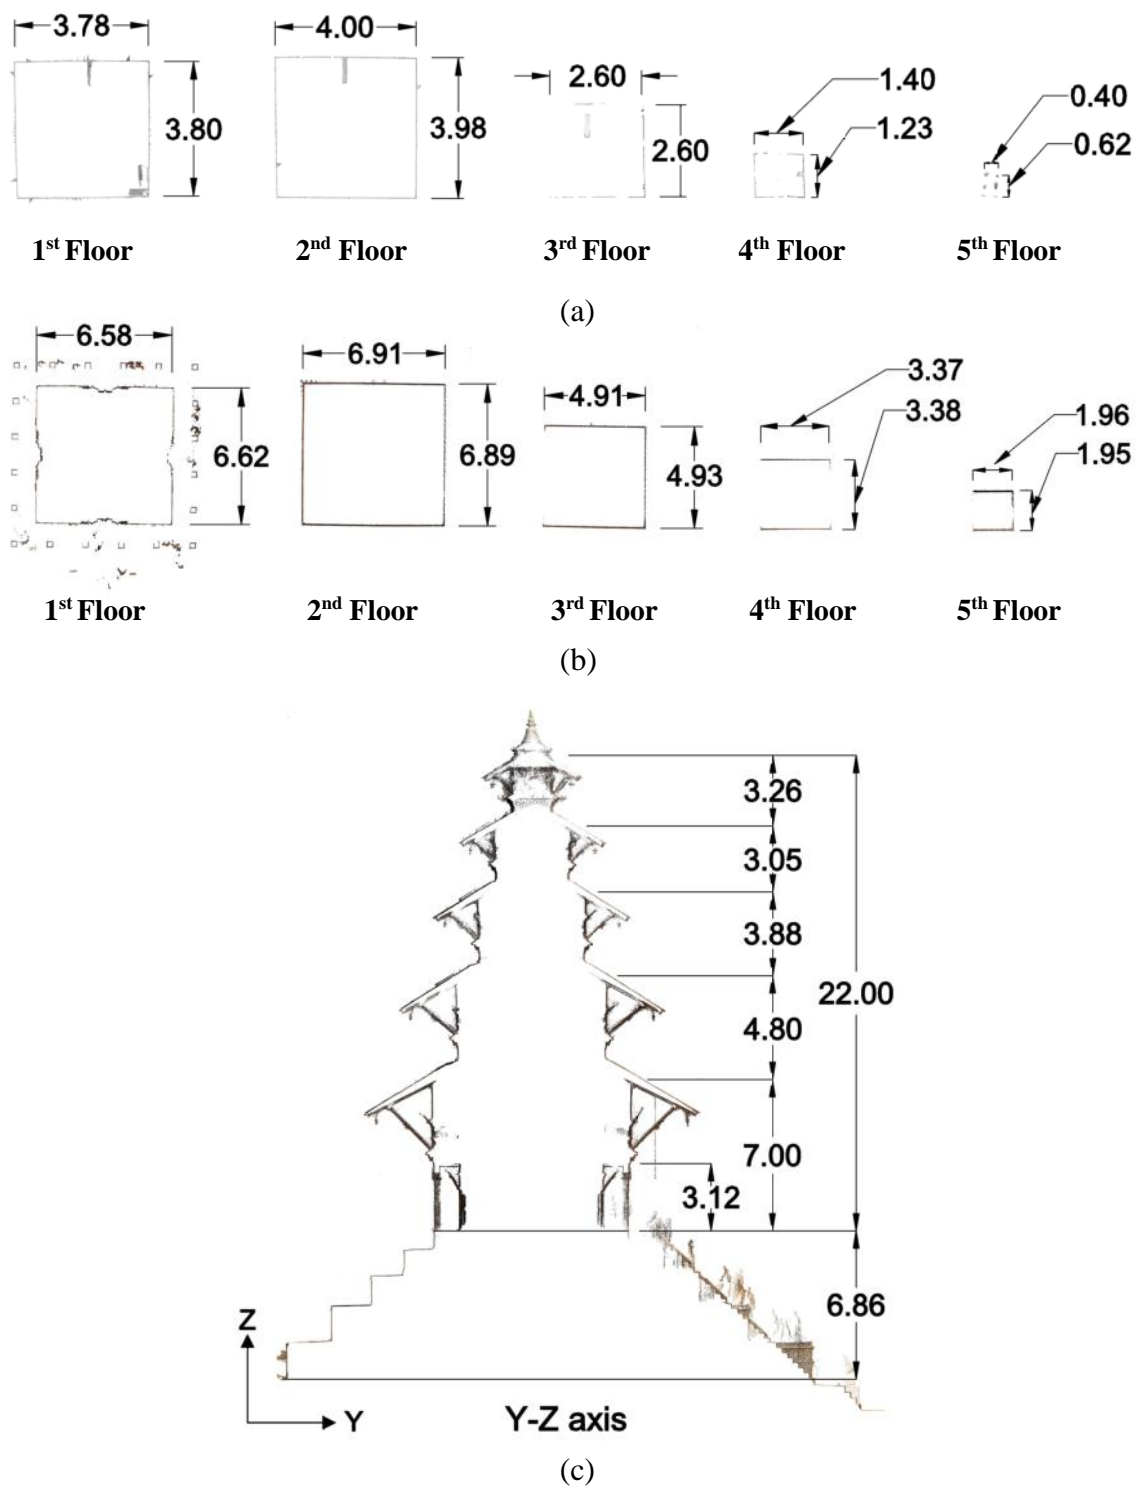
AutoCAD dimensions of Nyatapola Temple: (a) interior cross-sections in the XY plane, (b) exterior cross-sections in the XY plane, and (c) elevation view showing sections in the YZ plane. Note all dimensions are in meters.
